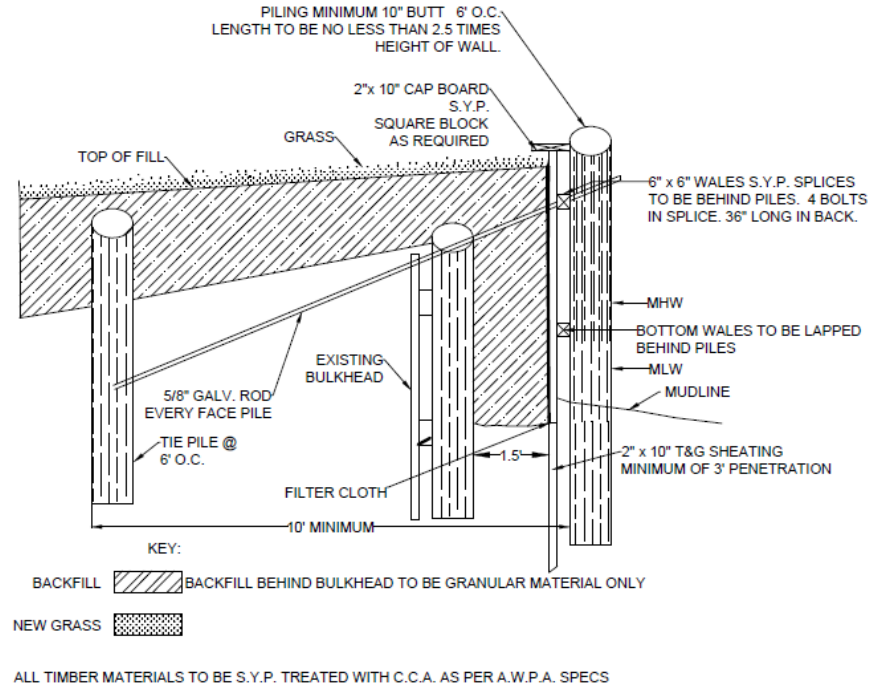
Typical Replacement Bulkhead Cross Section 3' to 5' High.
